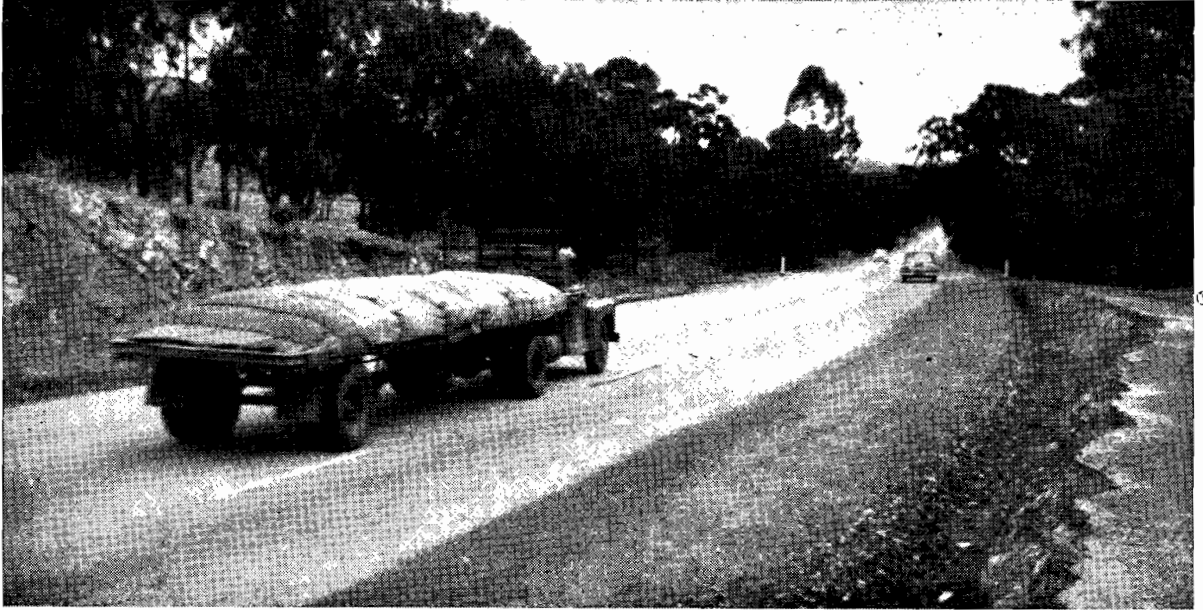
A reconstructed section of the Hume Highway near Monea.
